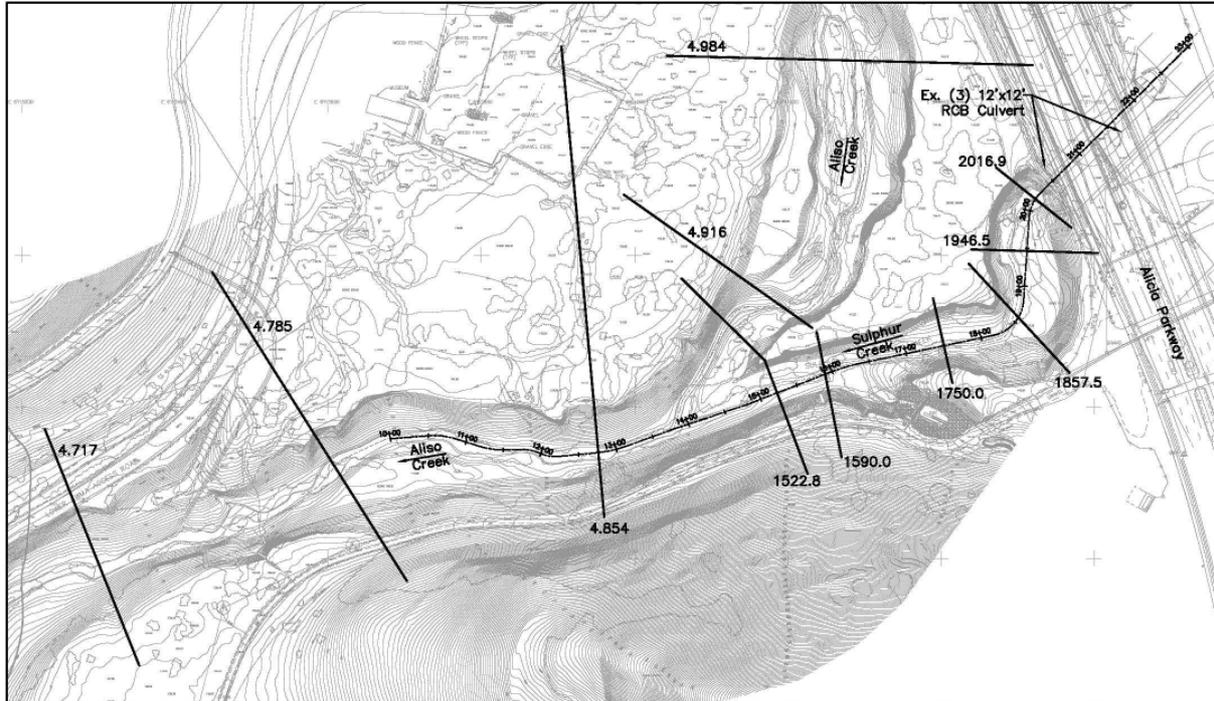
HEC-RAS Cross Section Locations (Existing Conditions)
